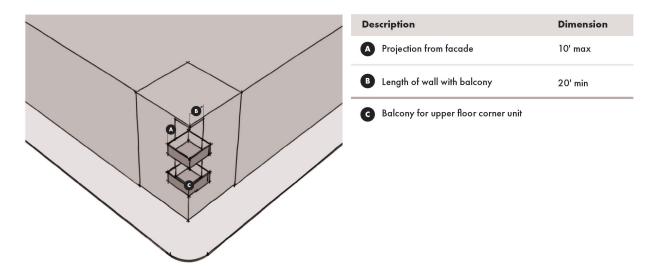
Z: RECESSED CORNER FROM FAÇADE
